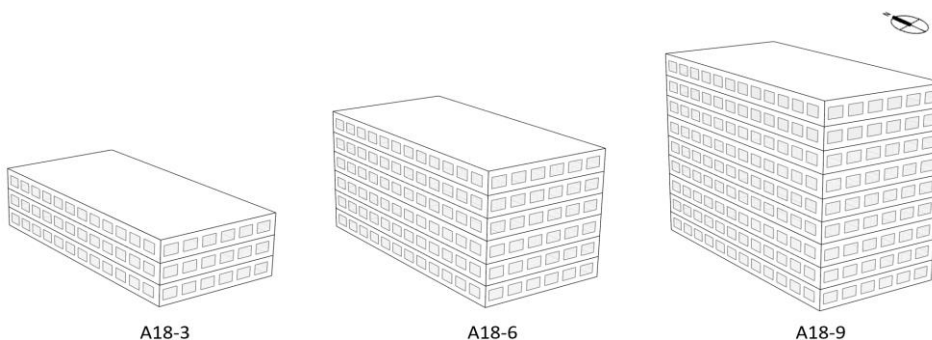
Building model A18 with 3 floors (A18-3), 6 floors (A18-6) and 9 floors (A18-9).
